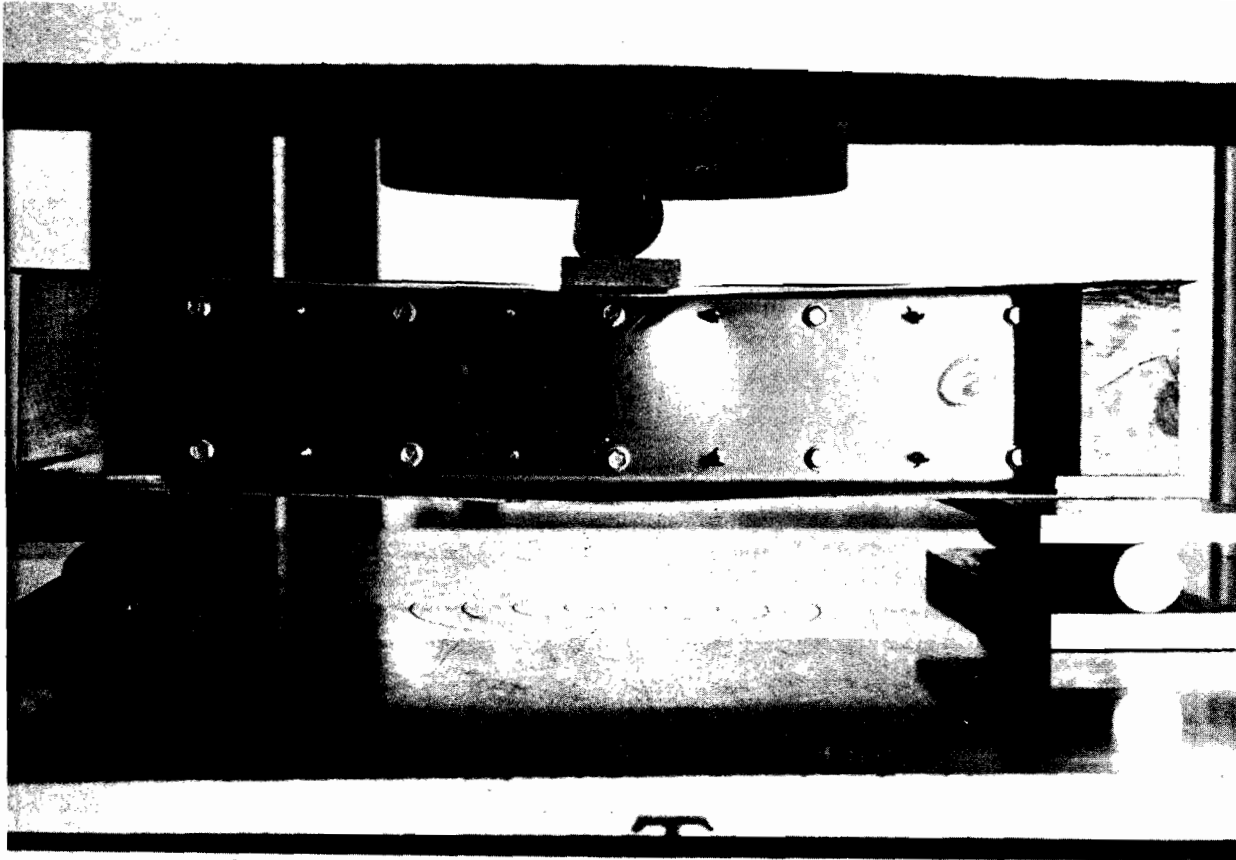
Photograph of Test Setup for Interior One-Flange
